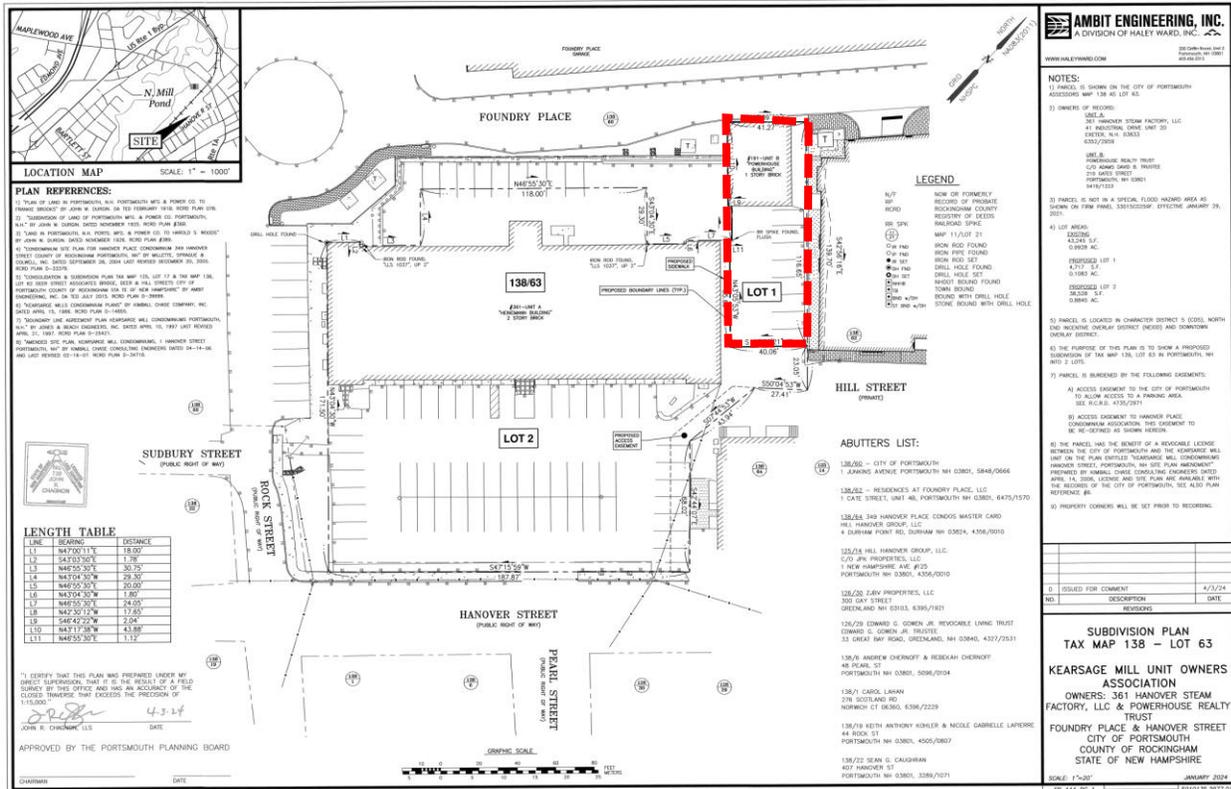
Proposed Subdivision Plan for Adams Parcel (4,717 SF)
